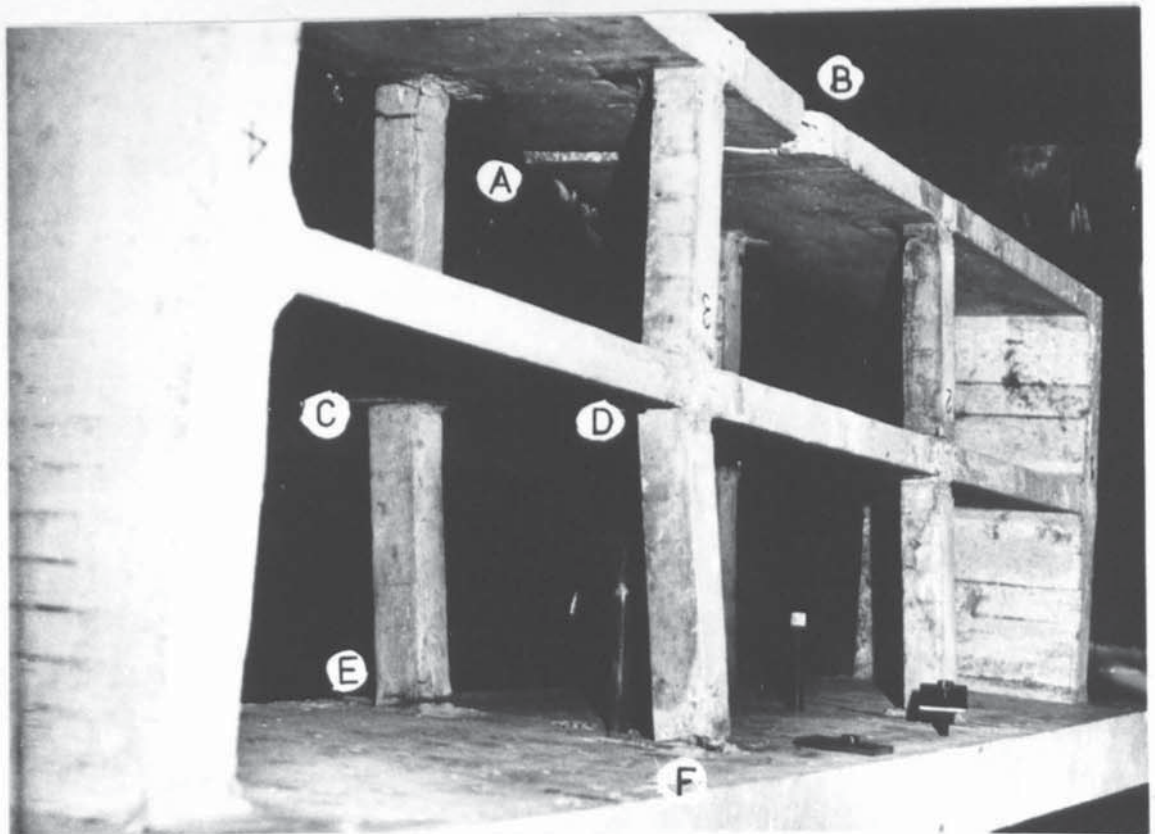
STRUCTURE 14 AFTER FAILURE
